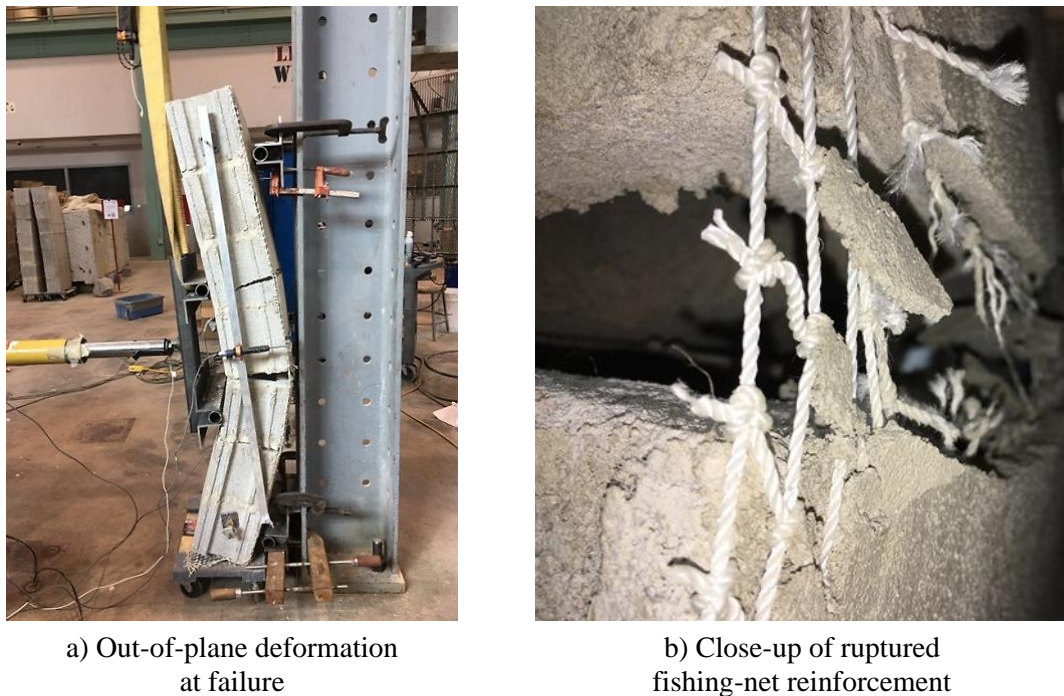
Failure mode of masonry specimen retrofitted with #21 fishing net-reinforced overlay.
